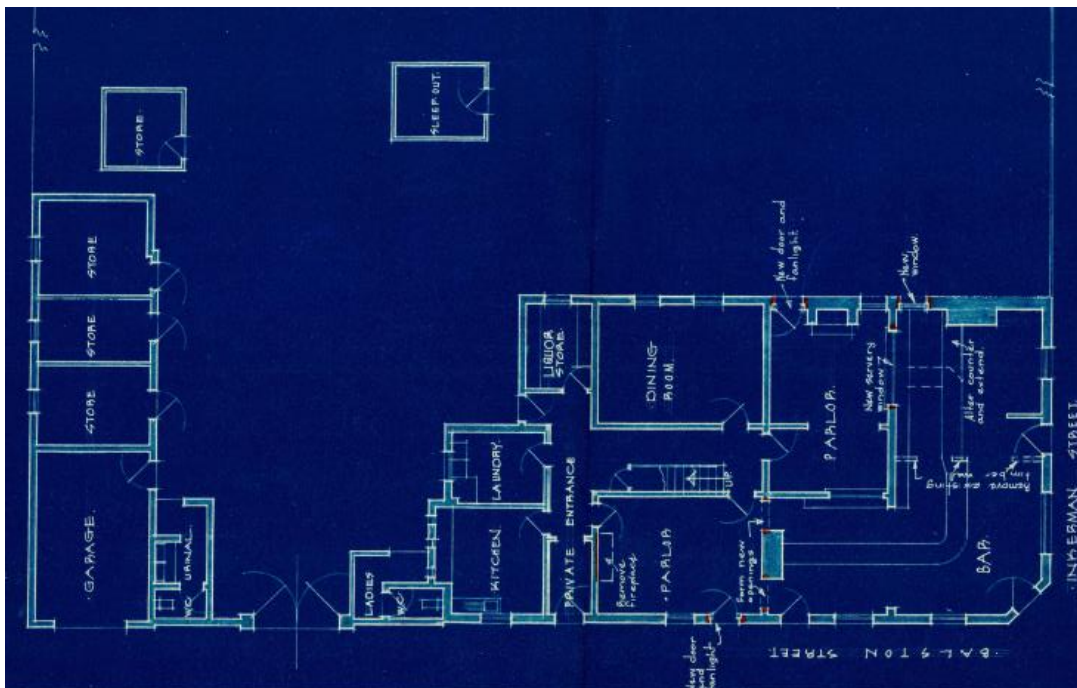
Plan showing proposed alterations to the ground floor of the original Inkerman Hotel (Robert McIntyre & Assoc, 1950). Inkerman Street is at the right of the image. (Source: Council Building File labelled 'Unidentified Plans Balston Street')
